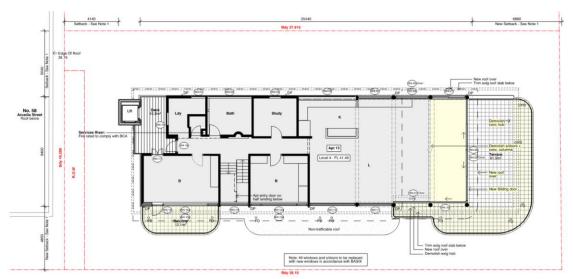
Approved floor plan (DA/3/2023) – 10 Major St, Coogee (Source: Ergo Architecture)
